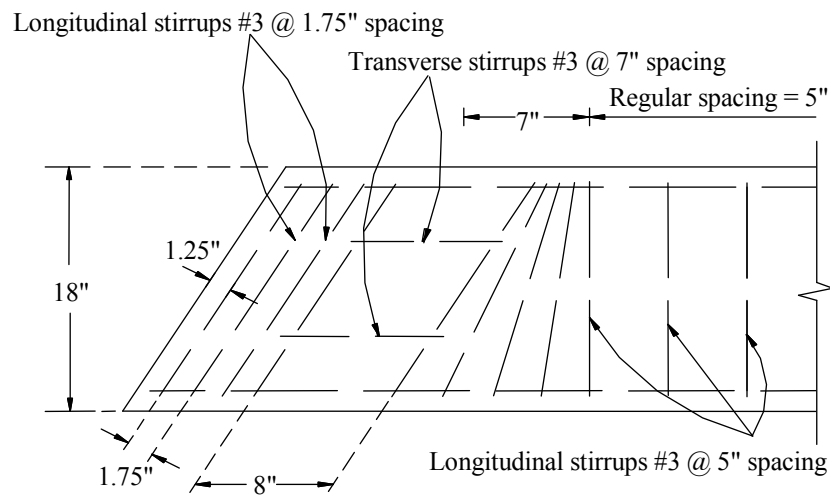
Reinforcement of interior box-beams at the end diaphragm.
